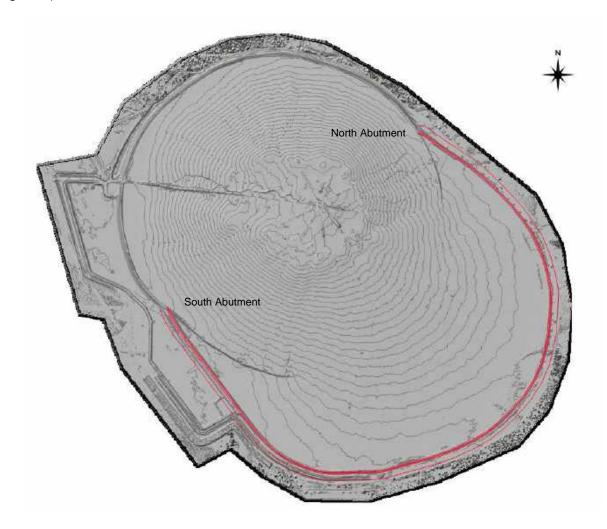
Location of CTD TSF Stage 12 Embankment Raise. Proposed Stage 12 Raise Extent Shown in Red
